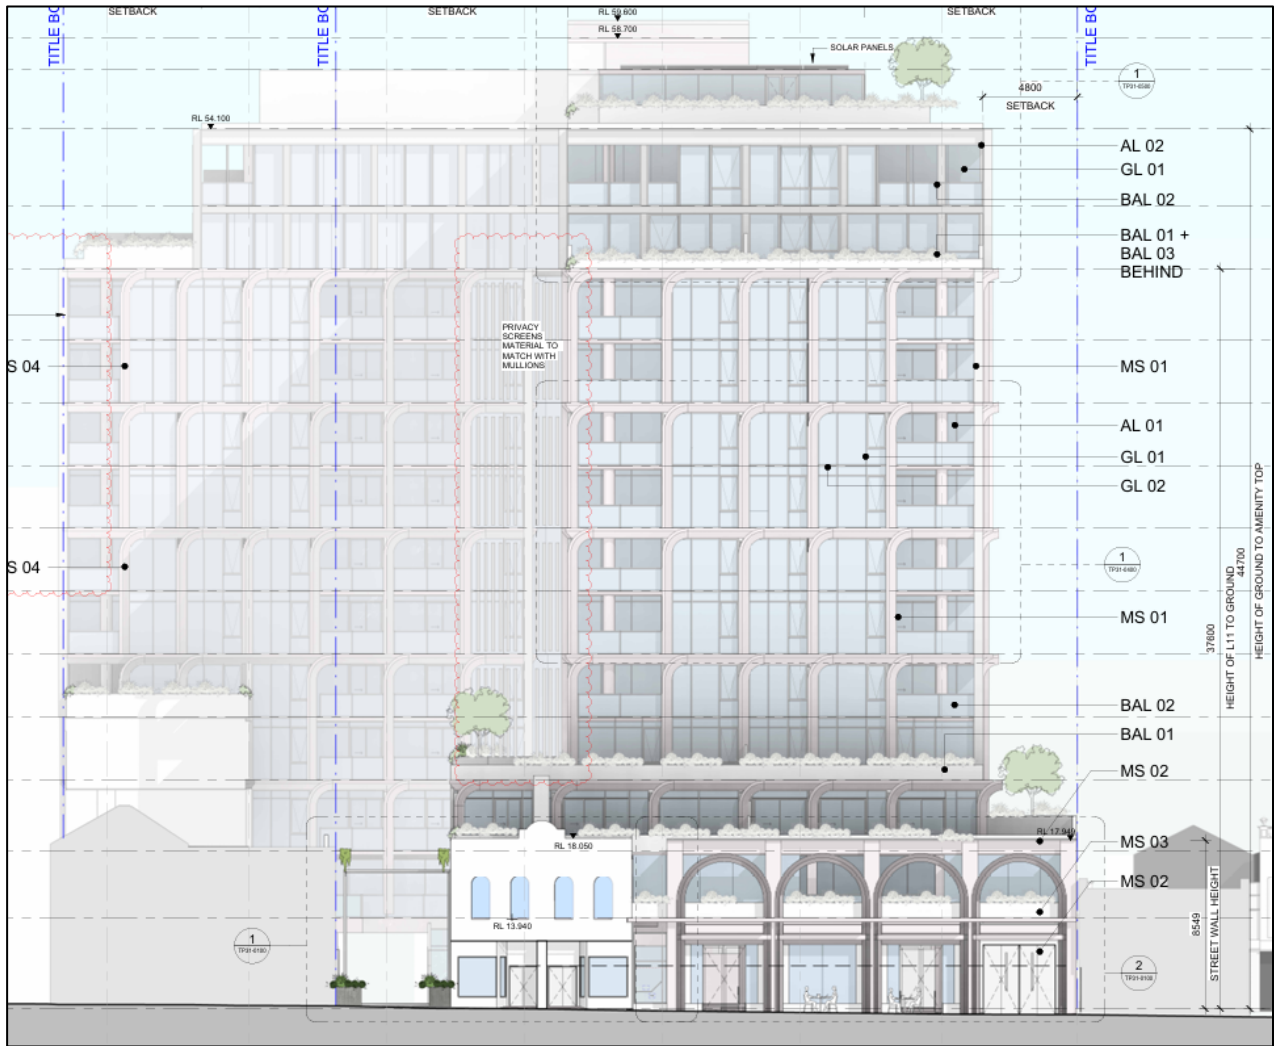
North elevation of the proposed 188-202 Swan Street Development.
